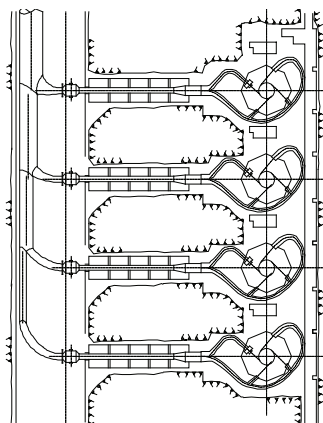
Plan of the valve house, powerhouse and assembly area – Pelton turbine.
